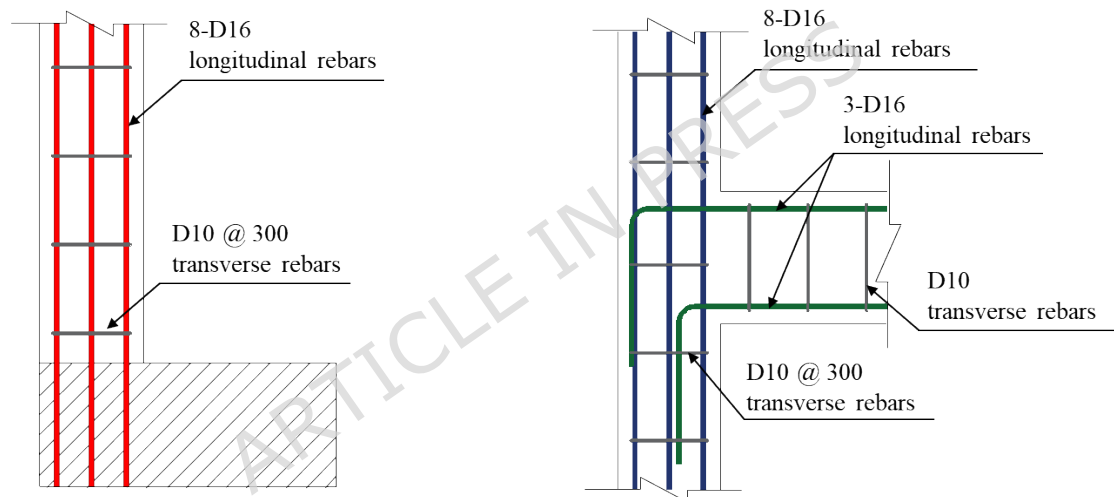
Typical Non-Seismic Details of Columns and Beam-Column Joints (unit: mm)
